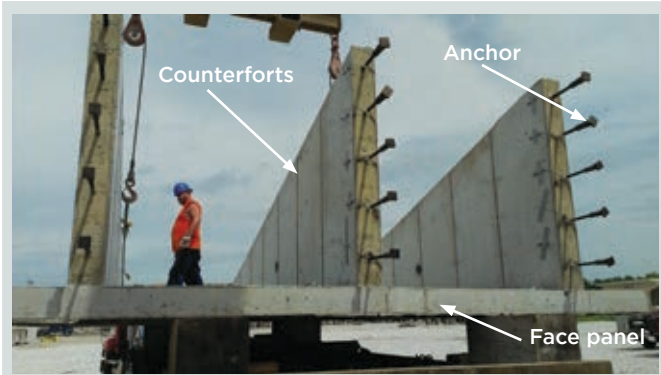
Totally prefabricated counterfort retaining wall system during erection showing anchors extending from the counterfort.
